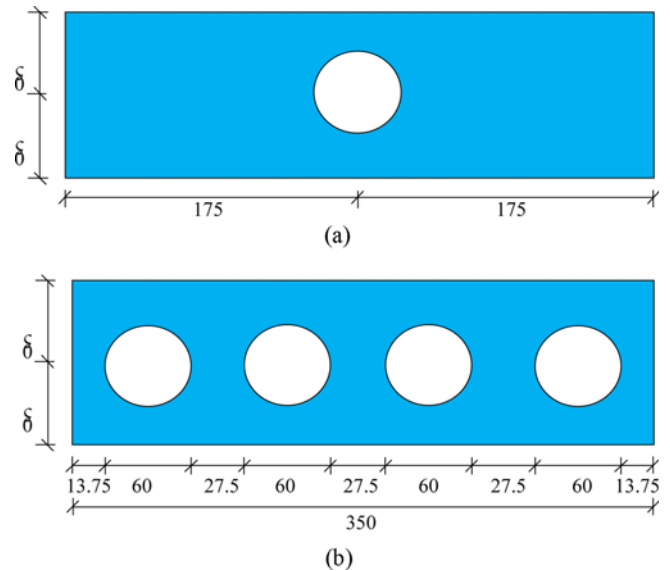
Schematic Diagram of the Perforated Steel Plate (mm): (a) Specimen with 1 Single Hole, (b) Specimen with Four Holes
